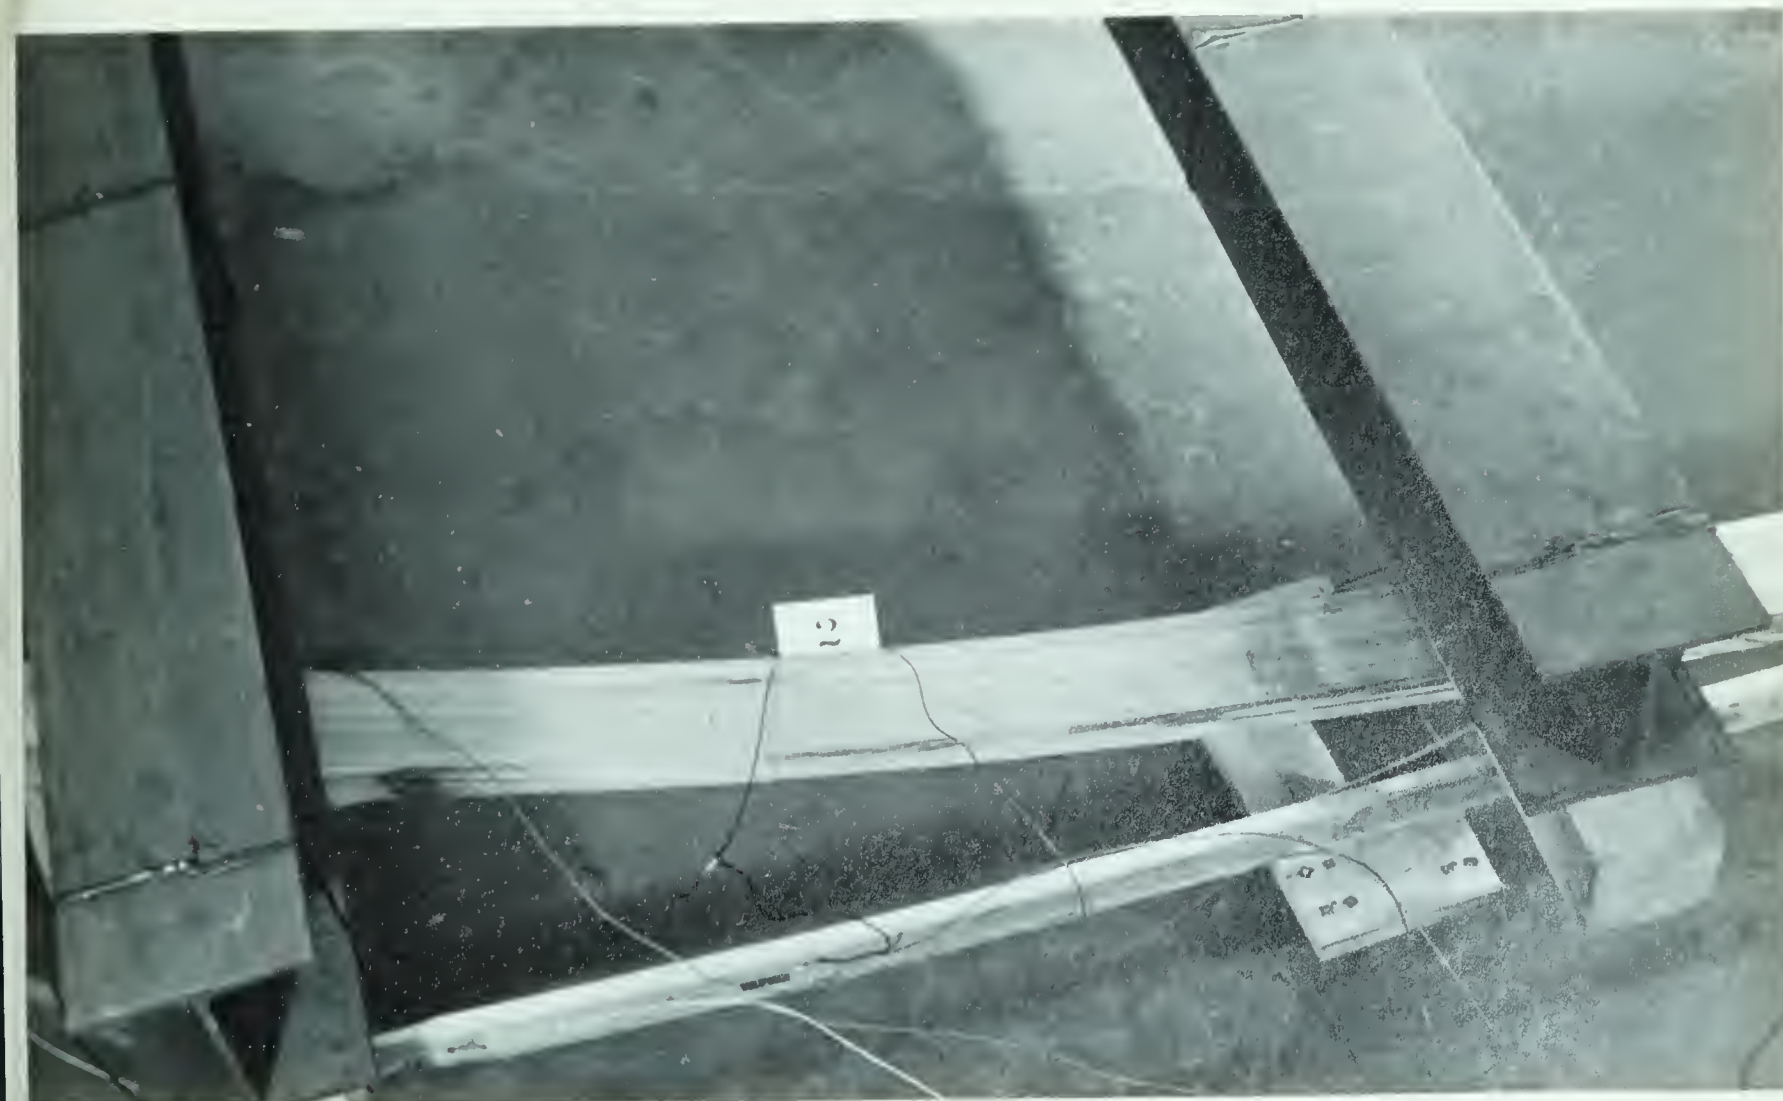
View of Failure in Arch Specimen No. 2.
